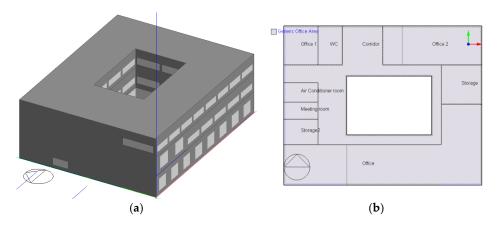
Building cooling load simulation model based on DesignBuilder of the office building. (a) External view and (b) interior division of standard floor.
